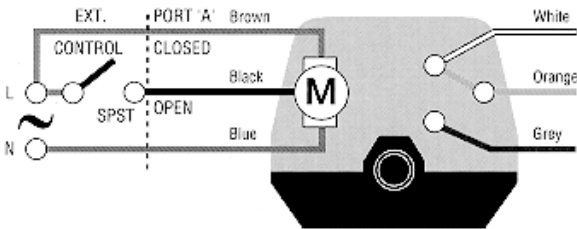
3 Wire Version VC Valve Actuator with Cable for SPDT controller
